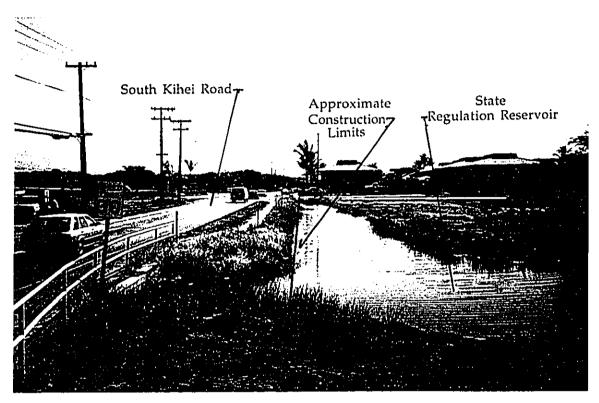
View South of Concrete Ditch Between Halekuai St. & Welakahao Road
